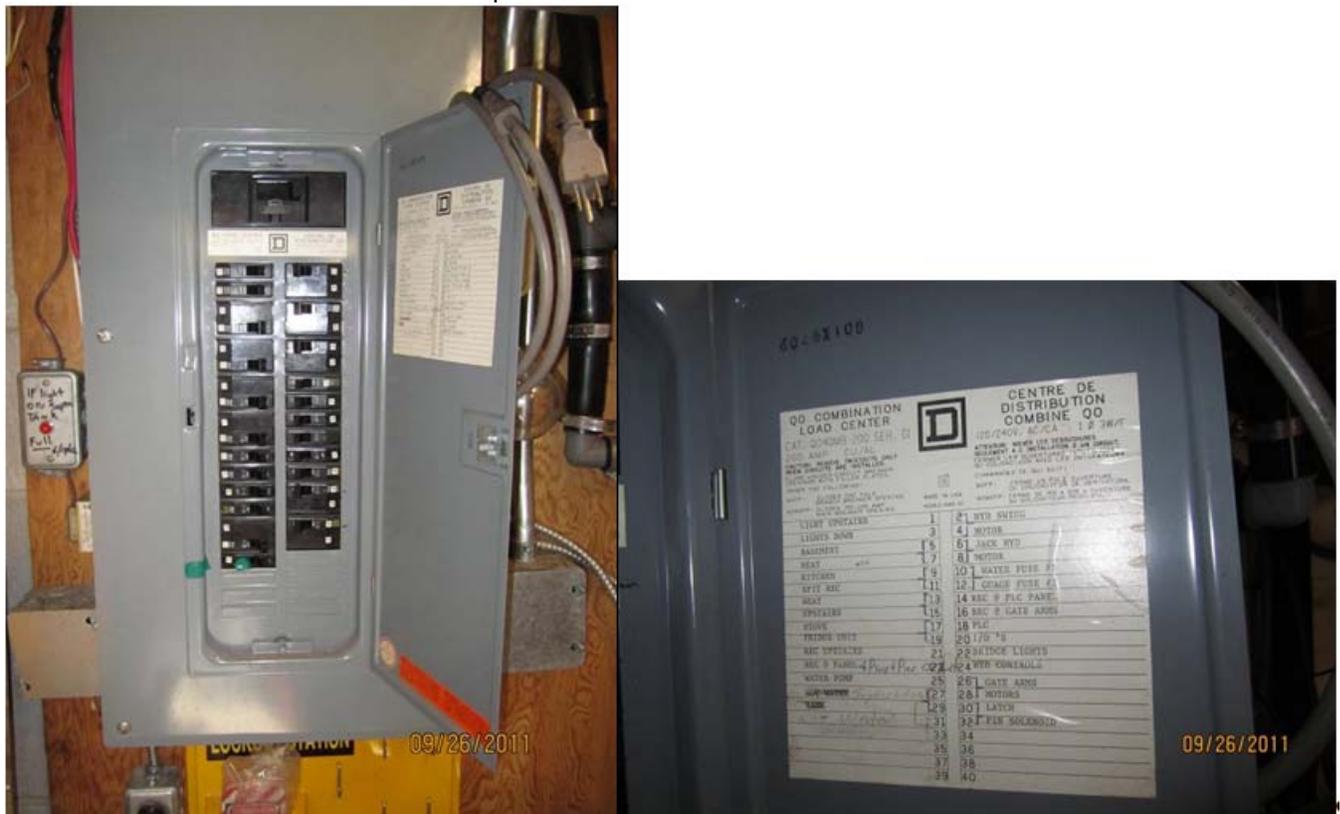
Main Distribution Panelboard. Note the building power and the bridge operating power is fed from this single source.
